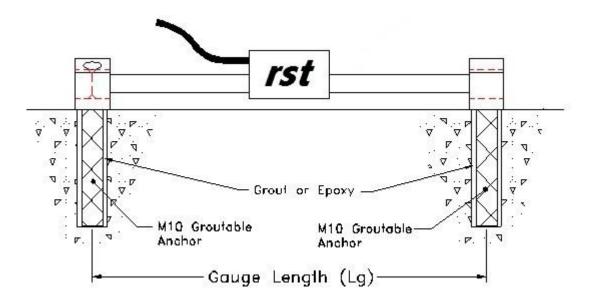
INSTALLATION ON CONCRETE USING GROUTABLE ANCHORS
